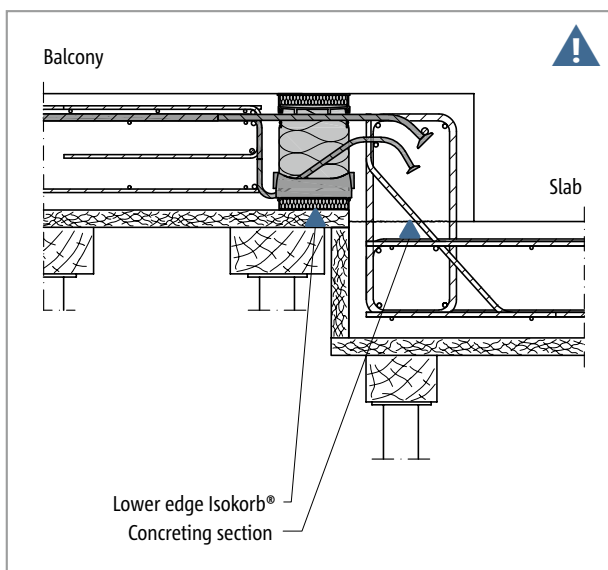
Schöck Isokorb® XT type K-O: In-situ concrete balcony with height offset upwards
